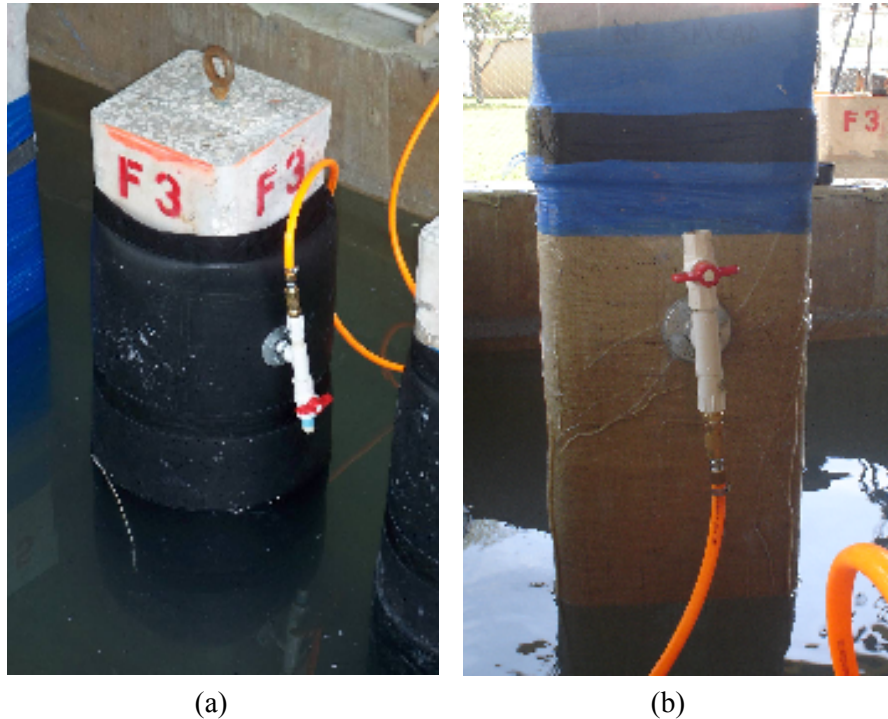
(a) Pressure Bagging; (b) Vacuum Bagging
